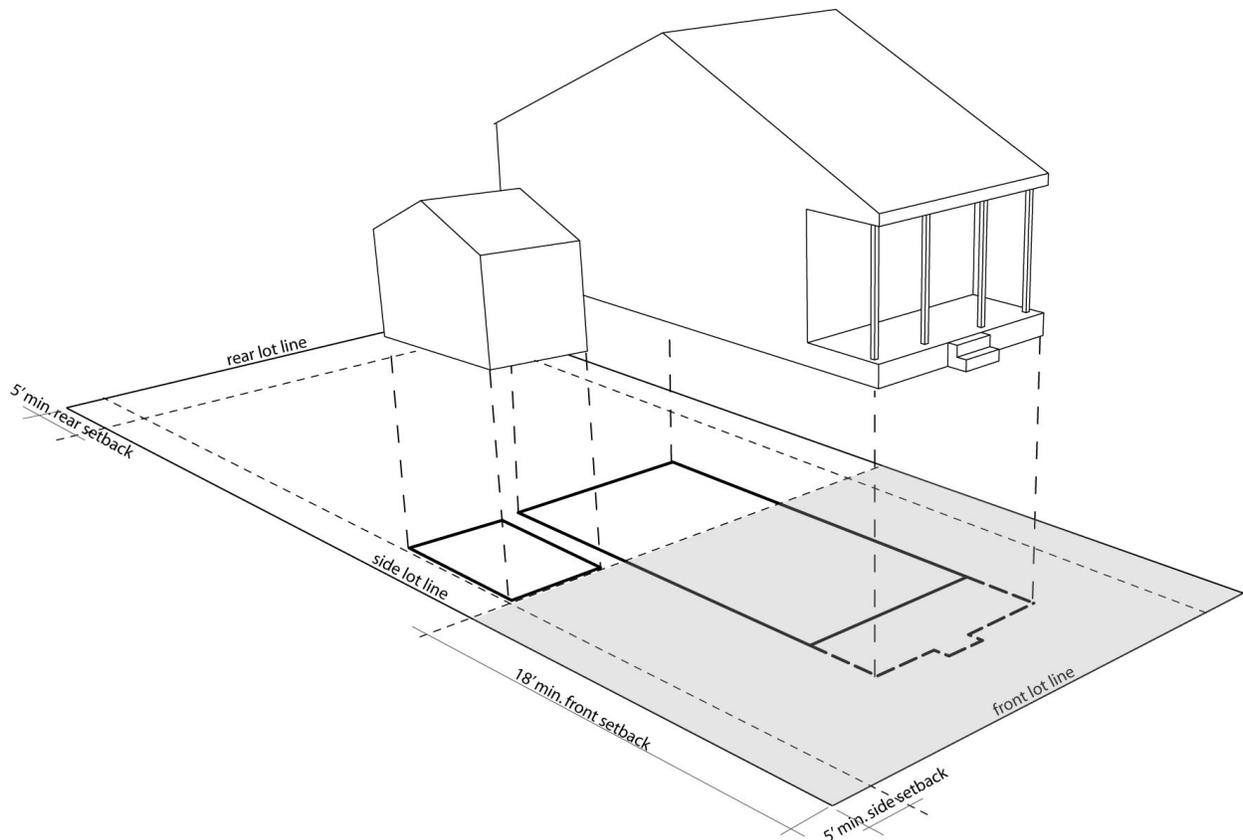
Minimum Setbacks for Garages Accessed from Street Frontage
